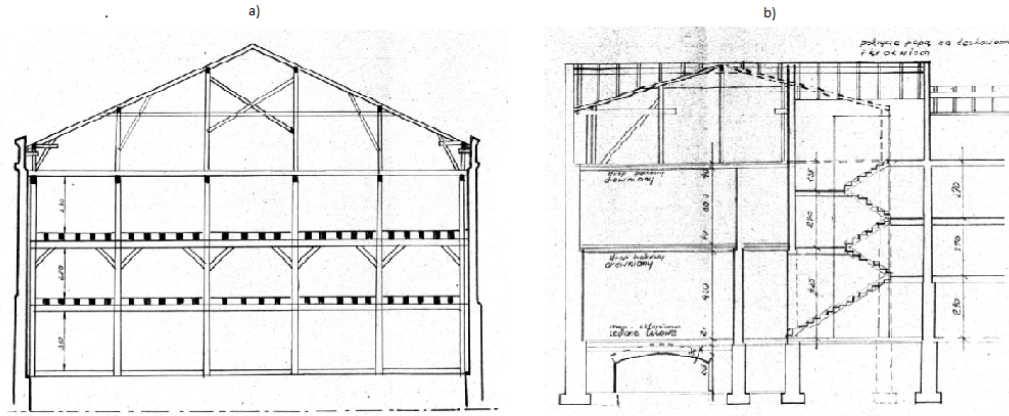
Building planned for modernization - cross-section: a) transverse, b) longitudinal (based on the archival construction inventory)
